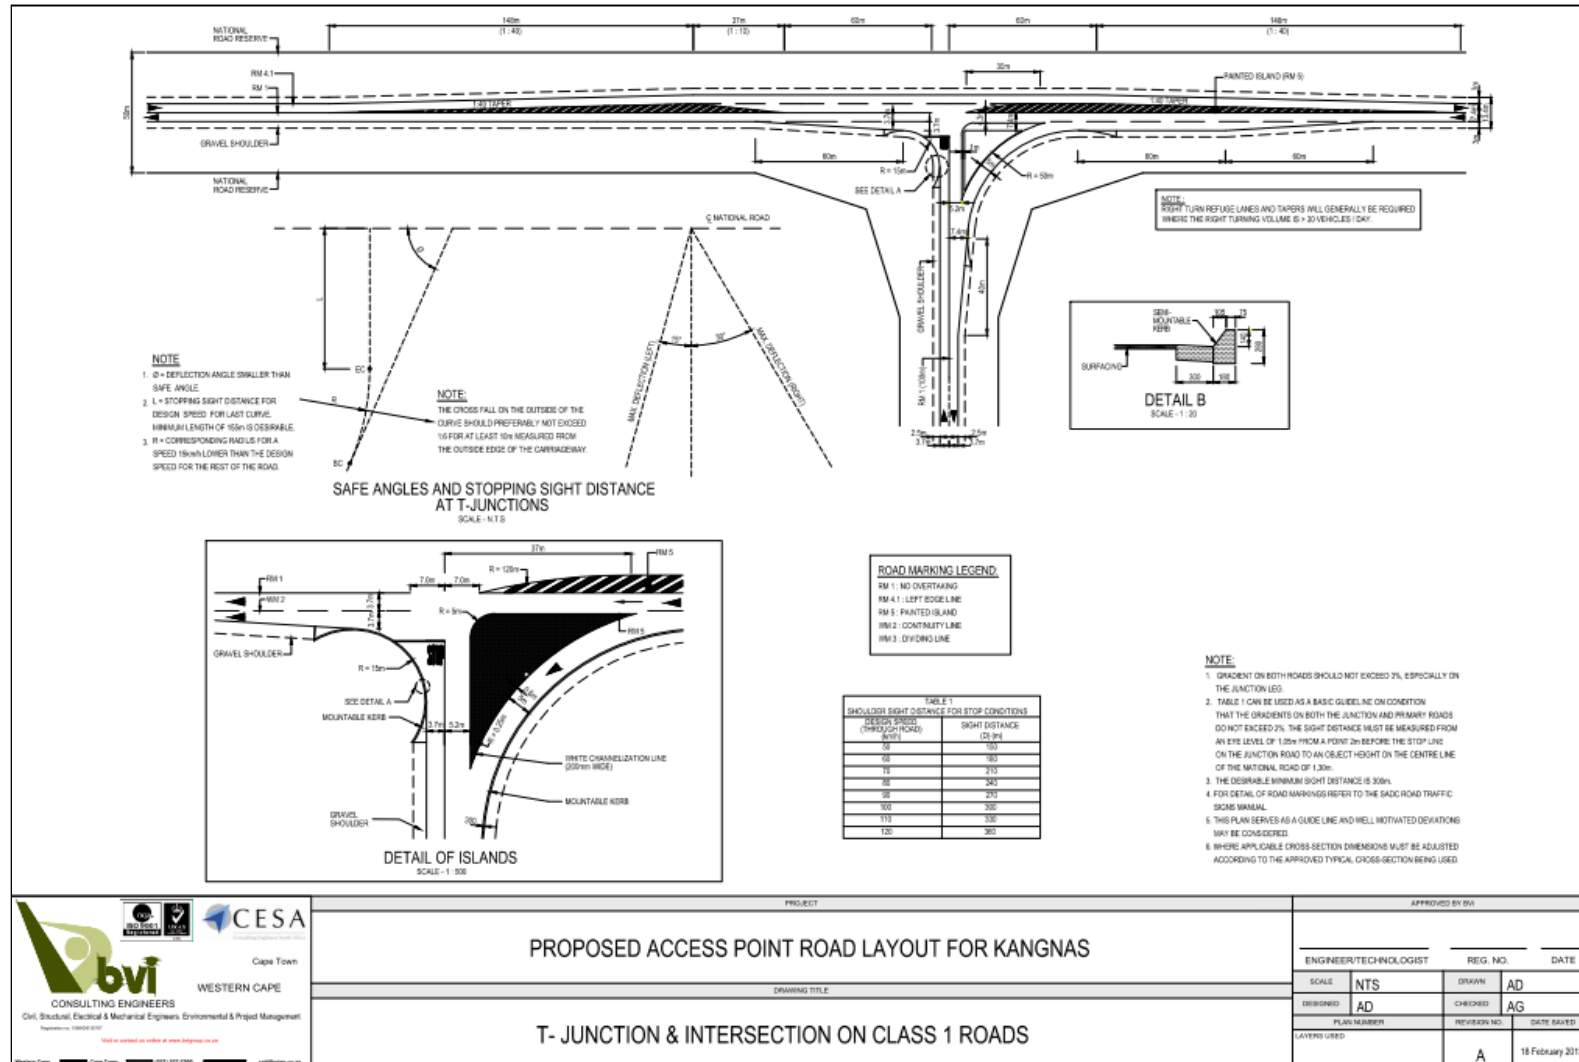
Proposed Access Road Layout for wind and solar facility
